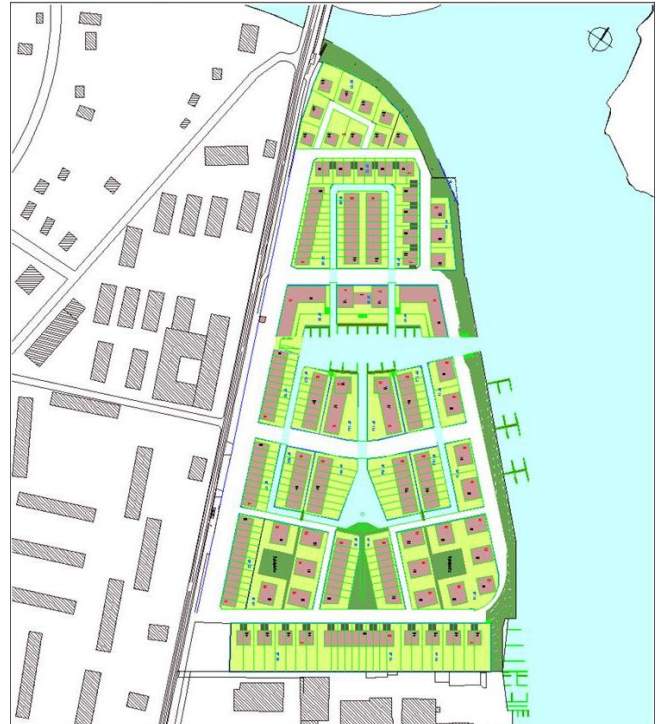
Detailed project plan of the building area (Meermann Invest Nr.7 GmbH, 2008)
